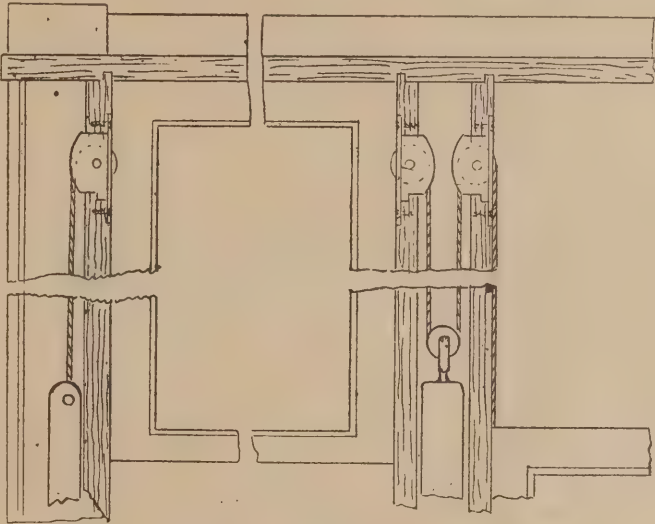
SECTIONAL ELEVATION OF CASED VENETIAN.
